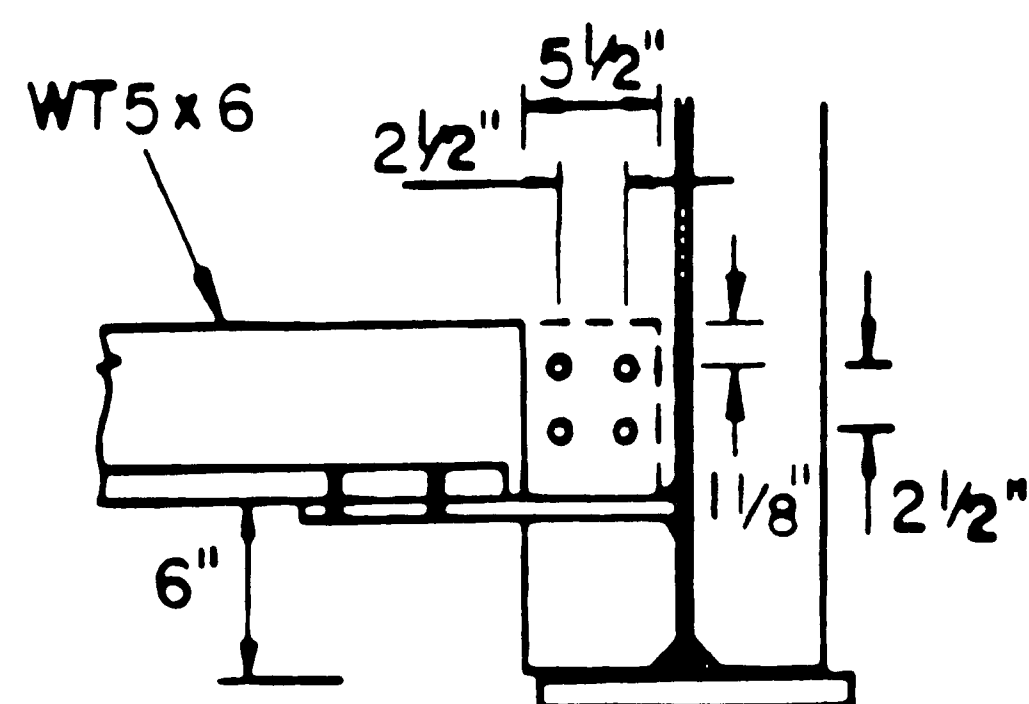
Cracking Along Transverse Weld Toes Opposite Gusset Plate Gaps
